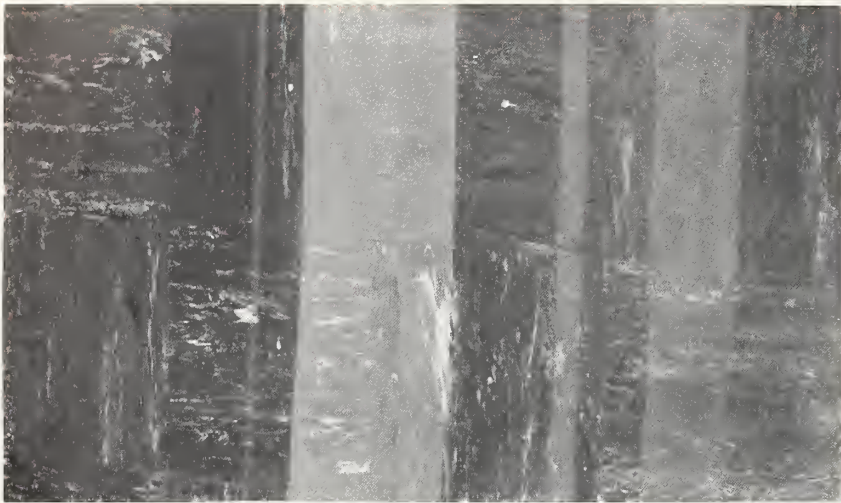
$\frac{1}{8}$ -in. rubber tile on wood subfloor (test panel 9R).
